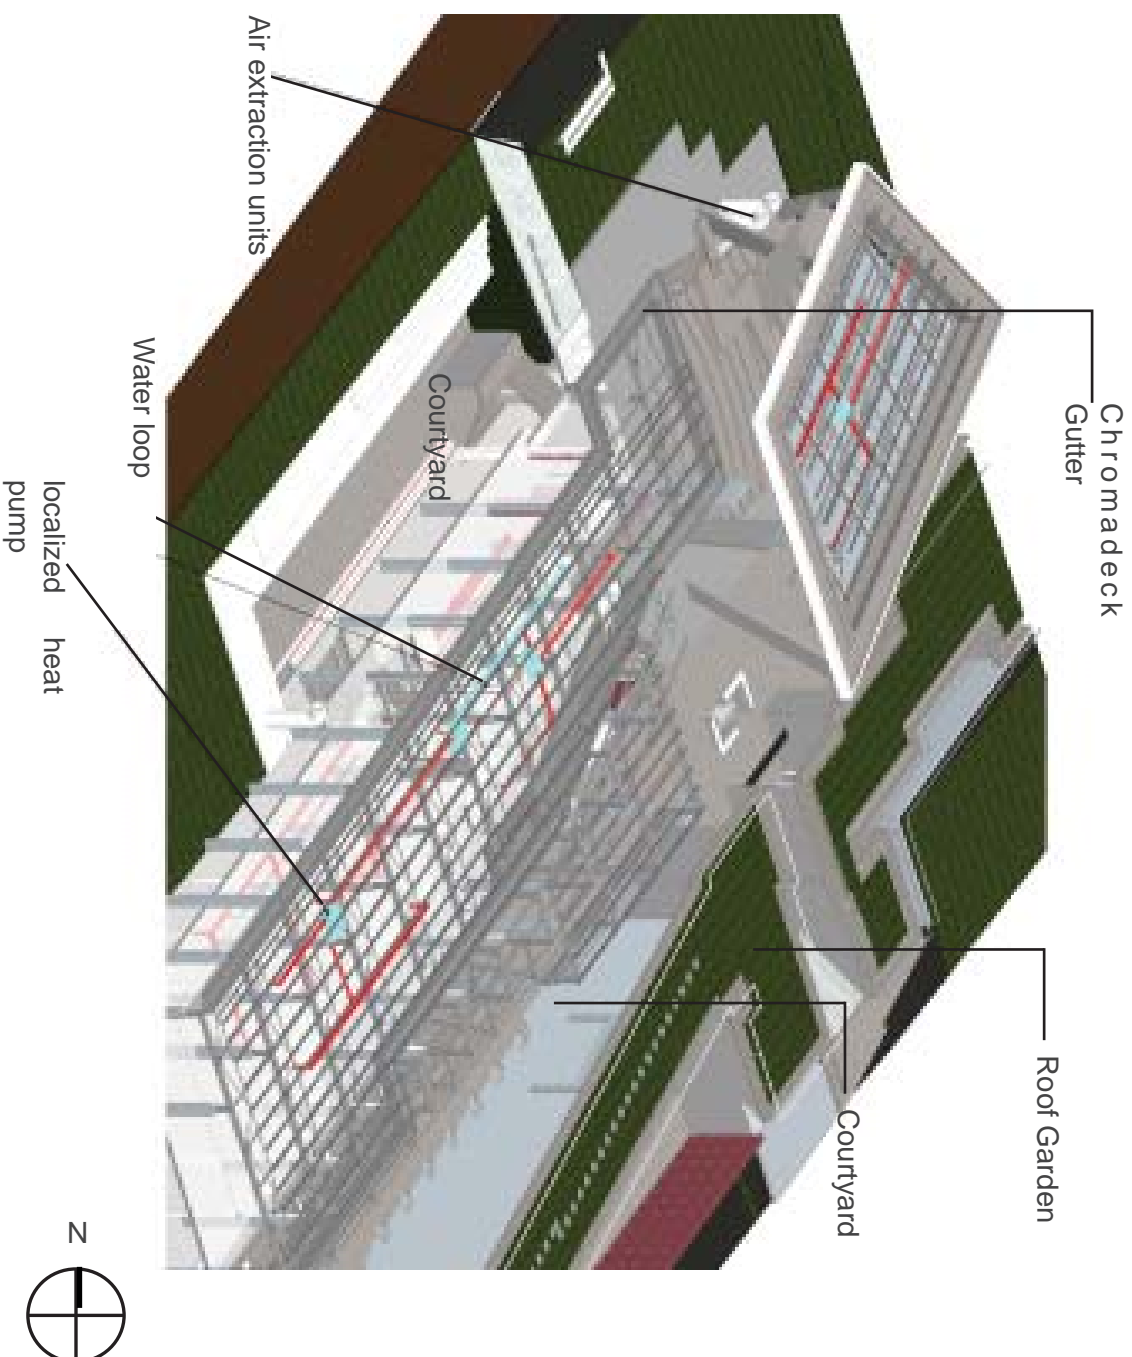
Axonometric view of steel construction exposing roof services
